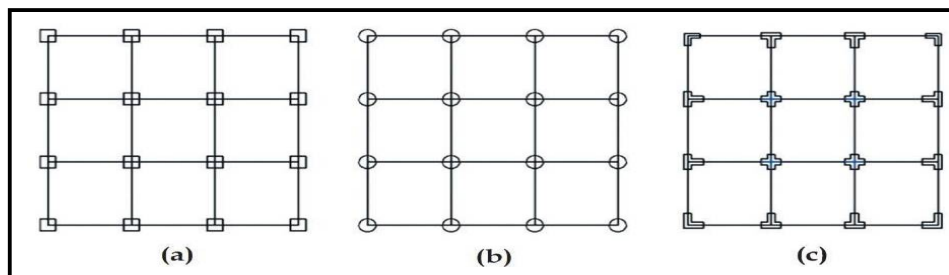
Plans having column cross sections (a) Plan with square columns, (b) Plan with circular columns, (c) Plan with plus, L and T-shaped columns [23]
